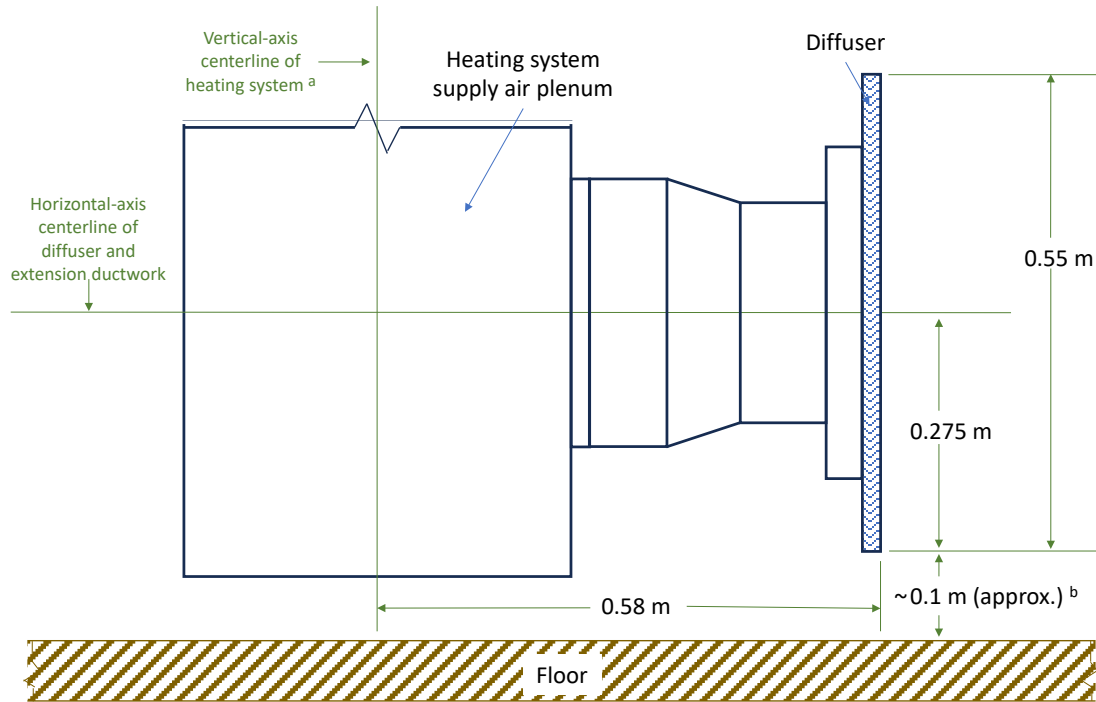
Diffuser and Extension Ductwork without Insulation, Elevation Section
